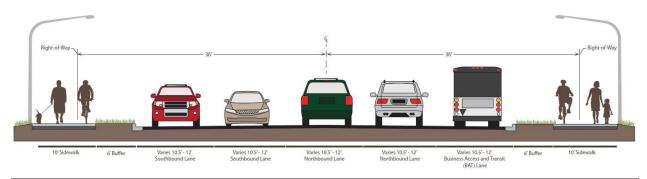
Proposed Typical Section – Warren Avenue Bridge to Callahan Drive
